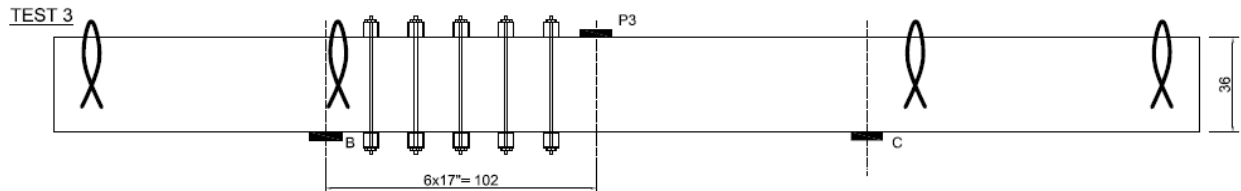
Beam 2 Test 3 Configuration (dimensions in inches).
